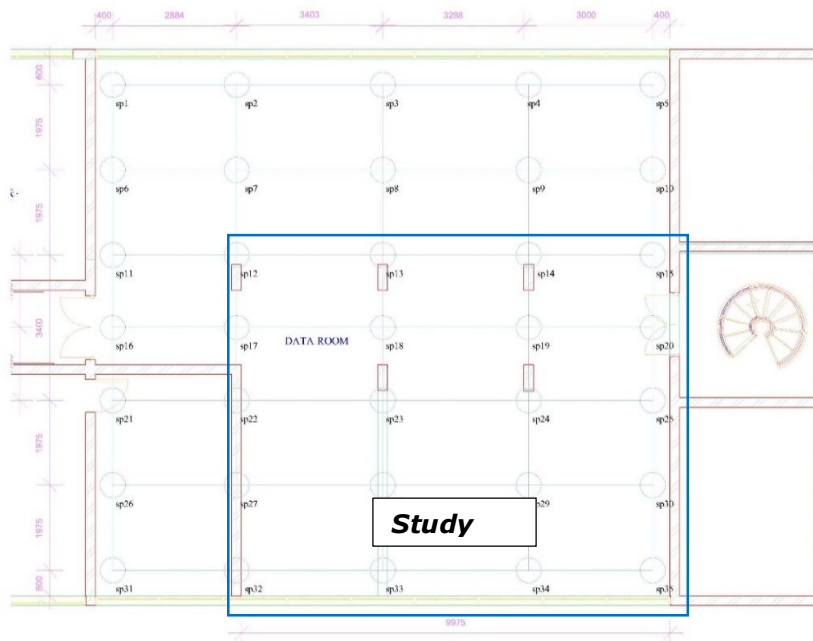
Floor plan of the selected reading room (Author's Fieldwork 2018)
